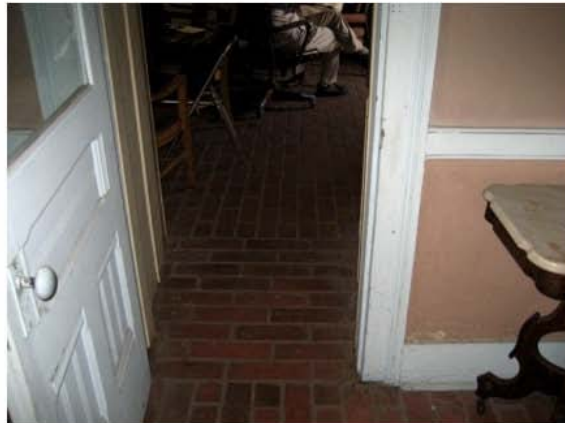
Details of early door and trim. Note brick floor, unusual for an adobe.
